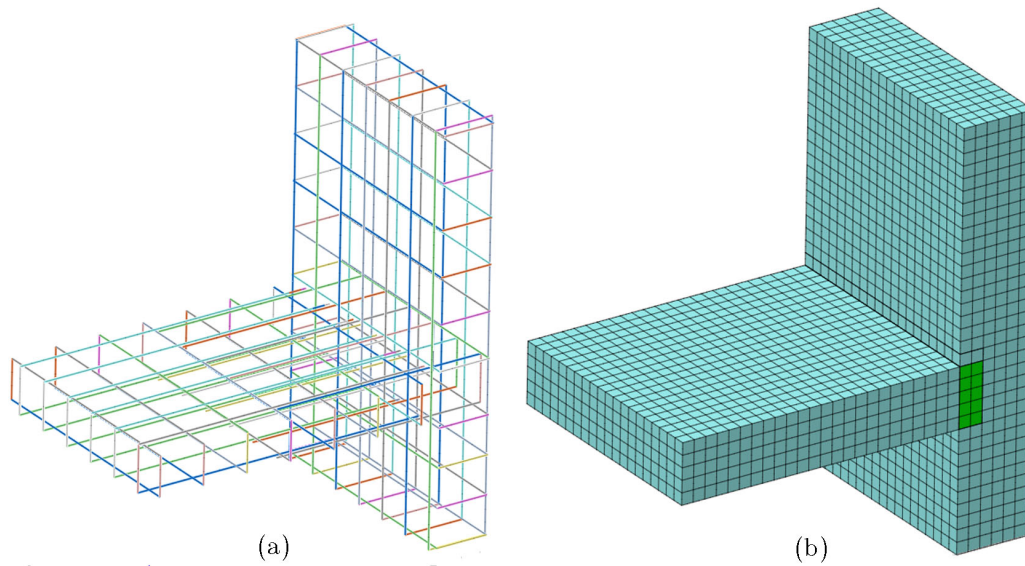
a) Reinforcement Elements b) Concrete Mesh
